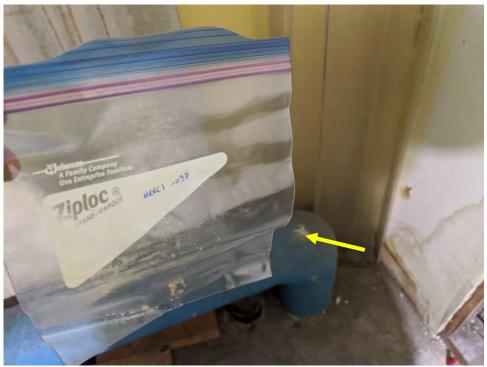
This photo shows sample location HERC 1-037 which is of ACM off-white insulation around a pipe elbow found in the fan room.
